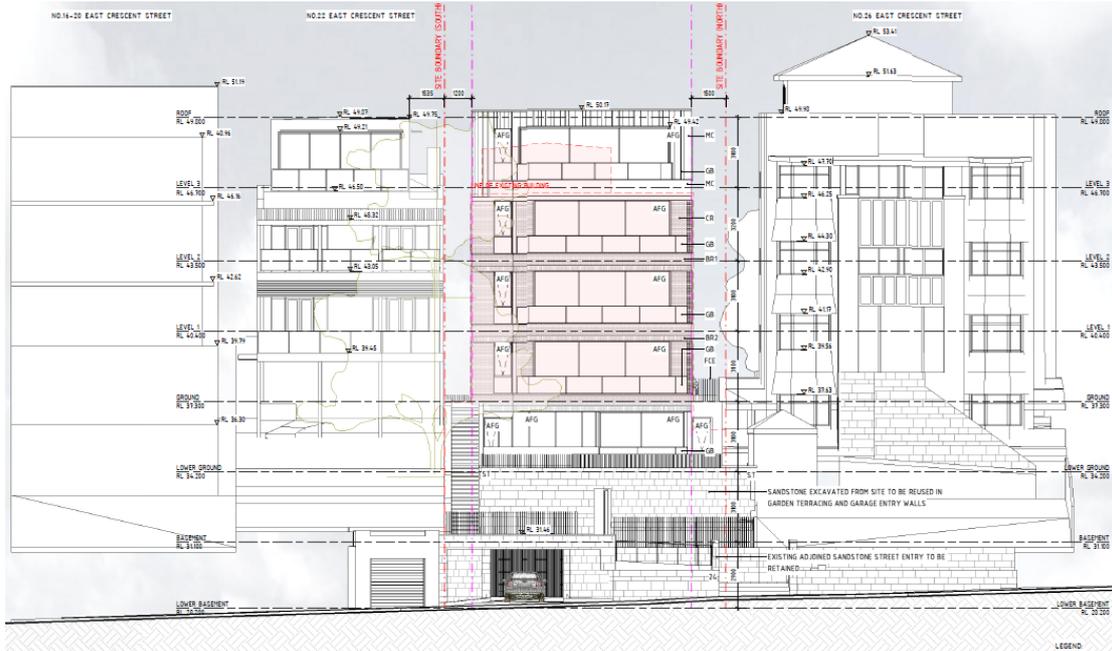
Plan extract showing the complimentary and compatible building height proposed notwithstanding the building height breaching element
